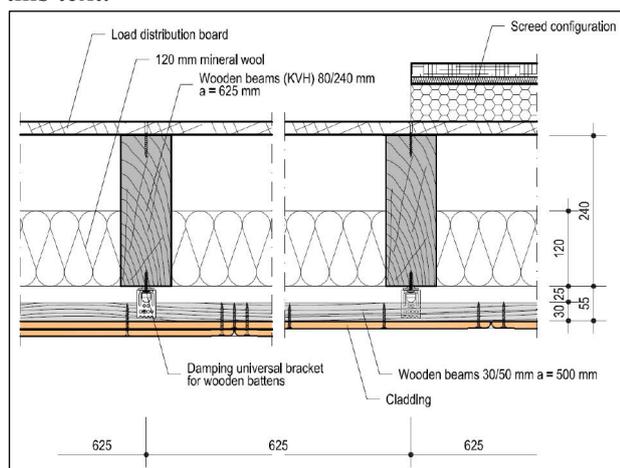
Basic ceiling, cross section perpendicular to the joists. Screed and lower claddings shown are examples.
